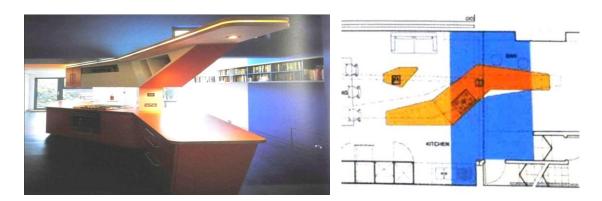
Picture and the plan of the linear design with a Z-shaped Island kitchen: (Asensio, 2006)
